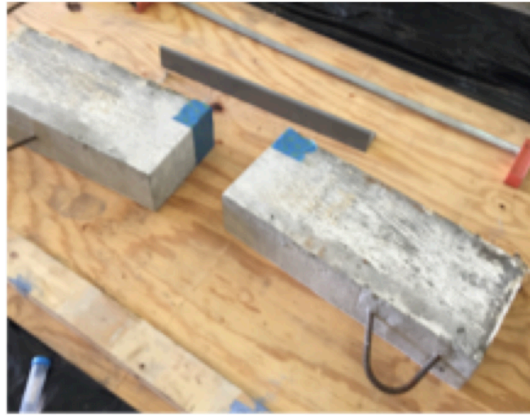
Preparation of epoxy-repaired beam: beam cut in half with masonry saw.
